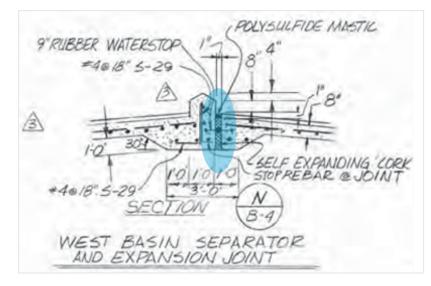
Unreinforced Expansion Joint, Drawing 10-B-7 from 1971 Drawings
